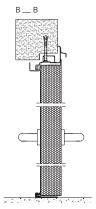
Vertical cross-section of the ECO double-leaf seamless steel door with a corner frame without a thermal break
